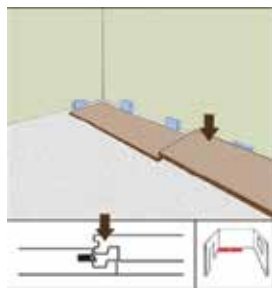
Place the second board into the first board and firmly press the end lock till you hear a click.
